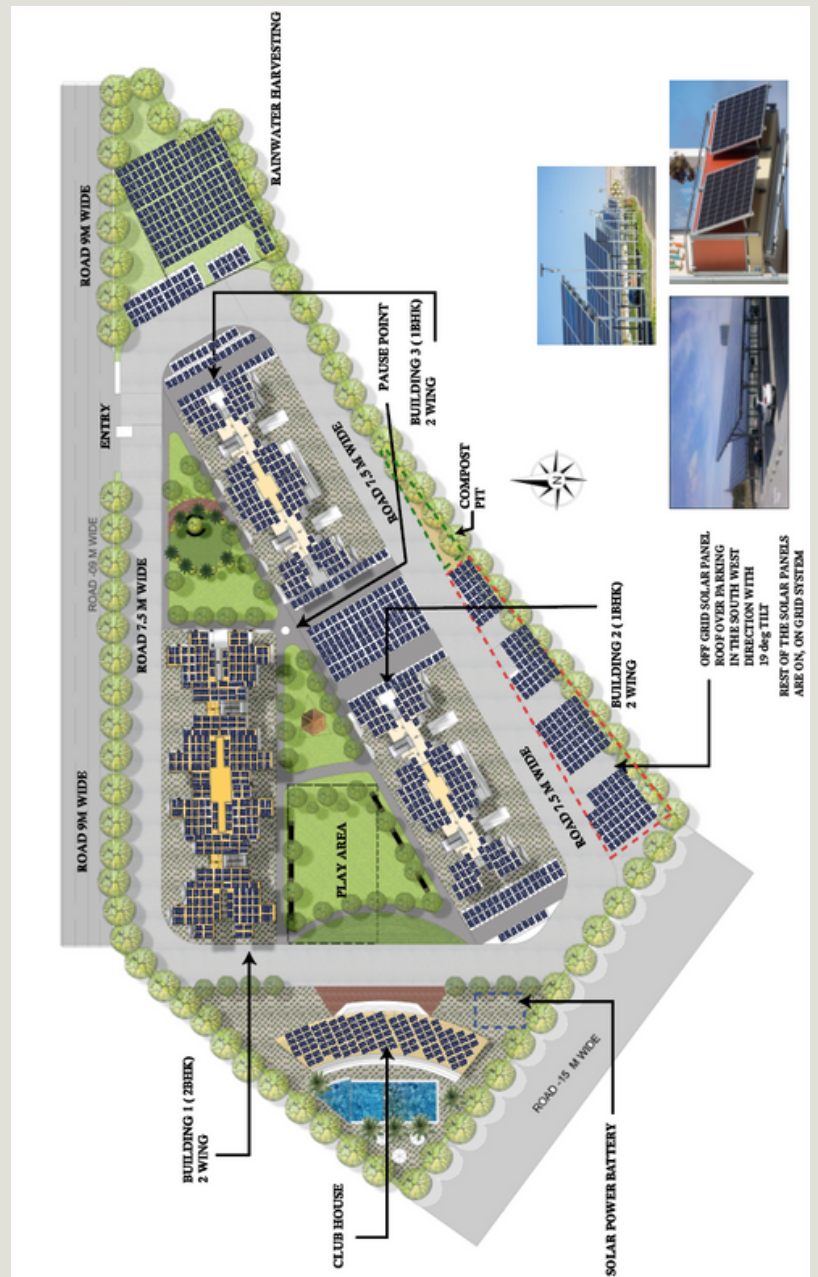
SITE PLAN SHOWING SOLAR ROOF, RAINWATER HARVESTING AND COMPOST PIT
